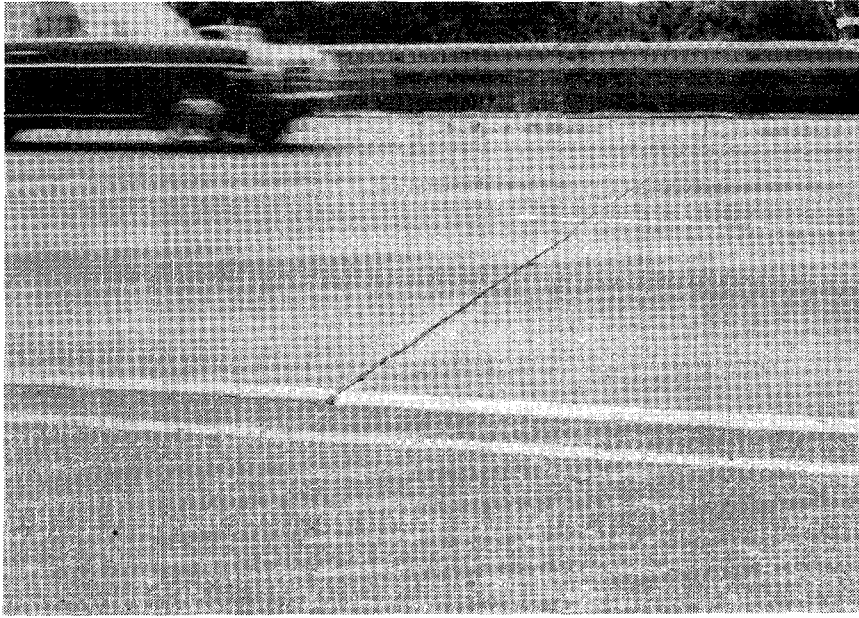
Illustration of joint faulting rated "severe" on a jointed concrete pavement (JCP-7-CA)
